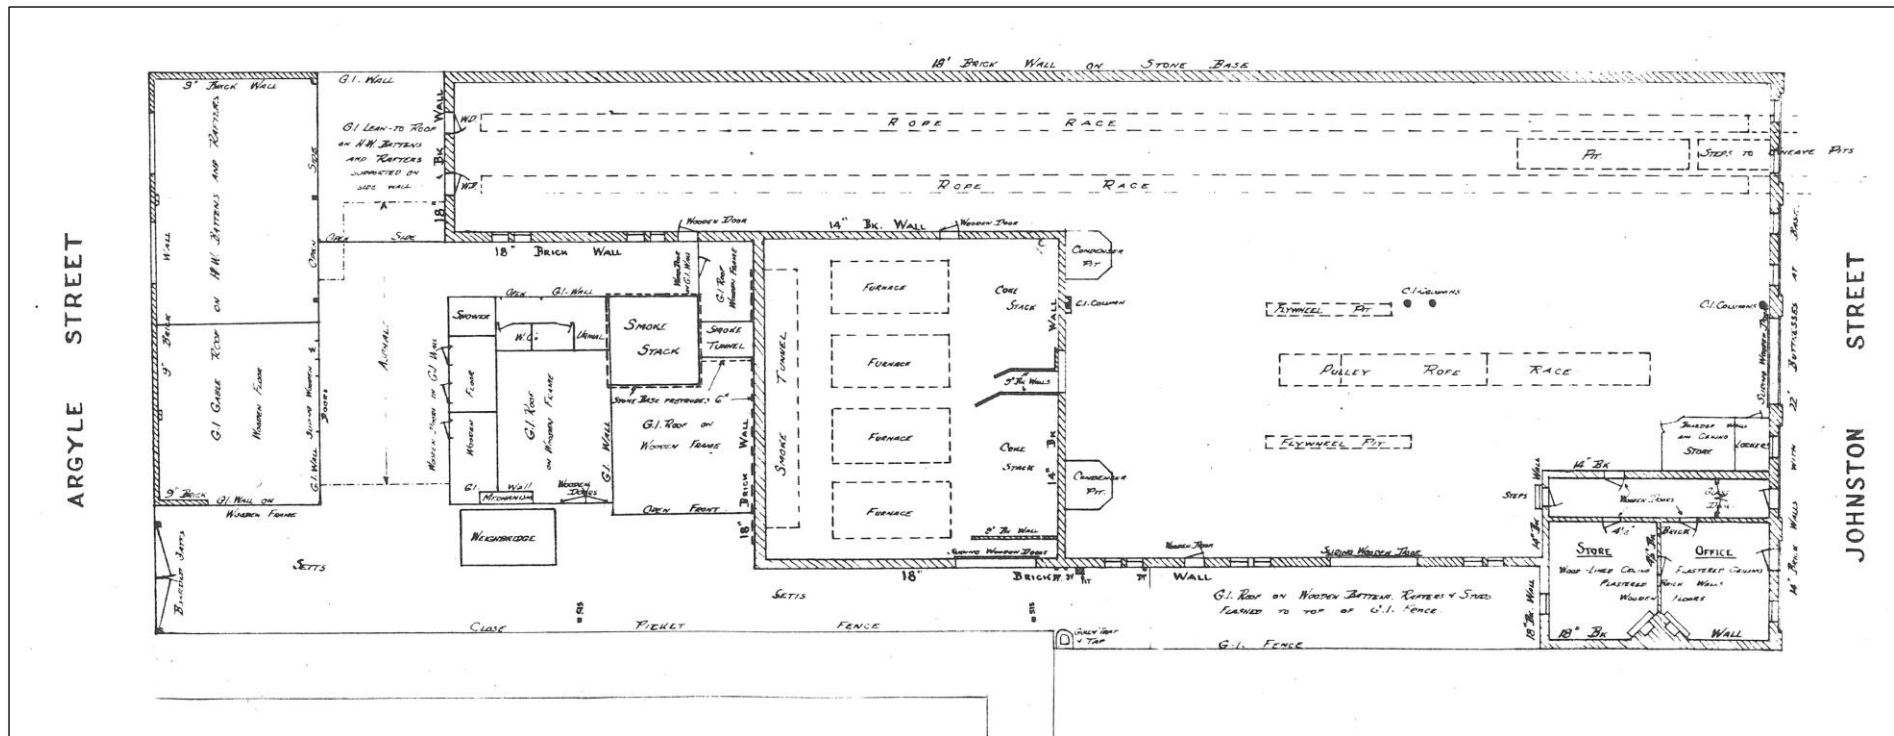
Plan of the Johnston Street Cable Tram Engine House, c. 1938. Image source: Victorian Collections
